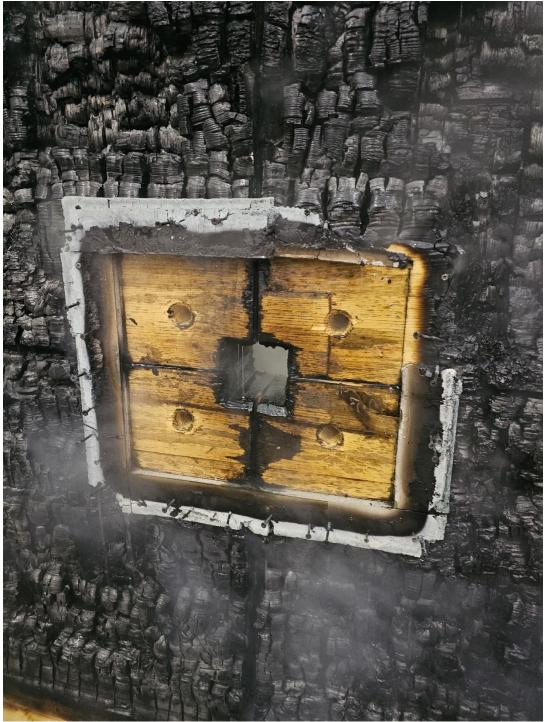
Fire side at HSS steel column penetration with steel plate removed.
